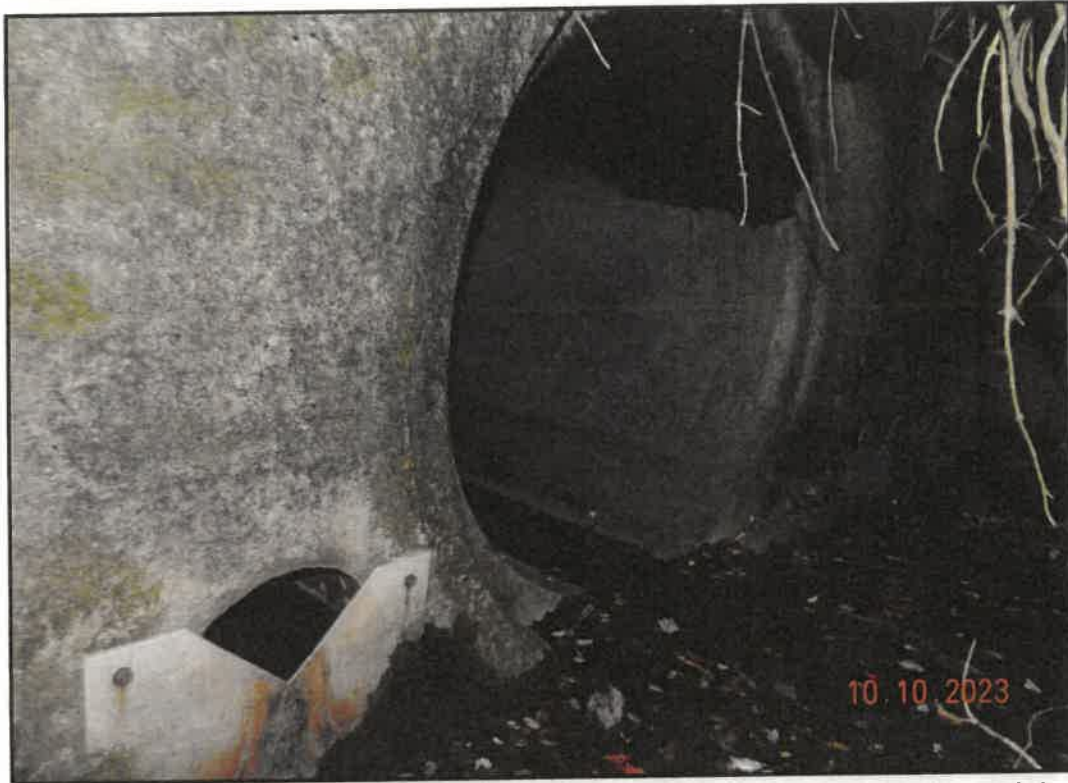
View of Reservoir Drain Outlet. Note, No Flow in Either Weir.
